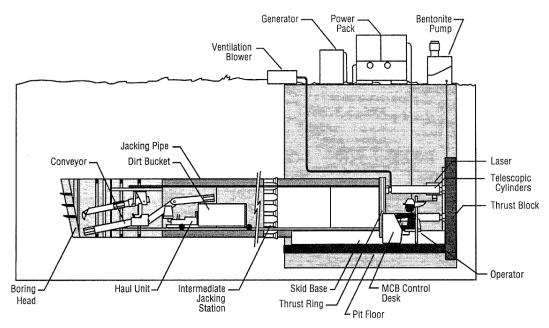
Typical Components of Pipe Jacking Process (Iseley & Gokhale, 1997)
